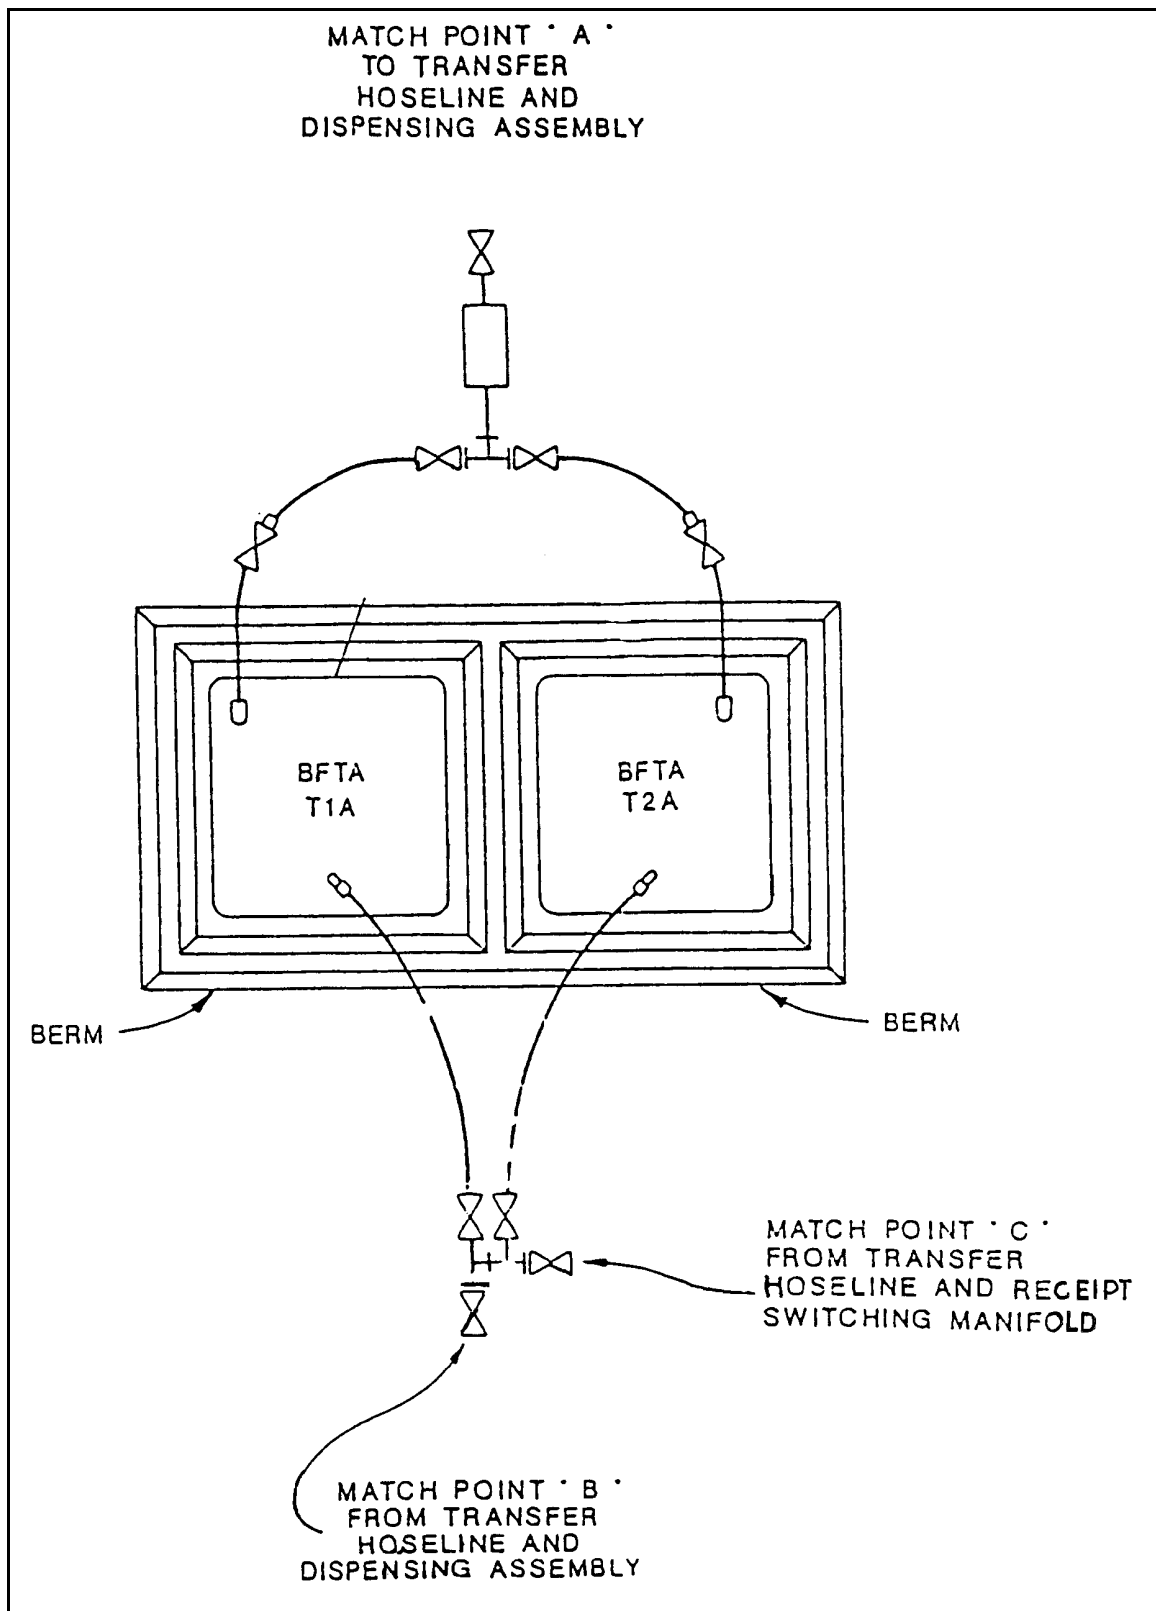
Tank farm (Module) assembly layout, typical layout with separate berm construction, hose, valve, and fitting installation
